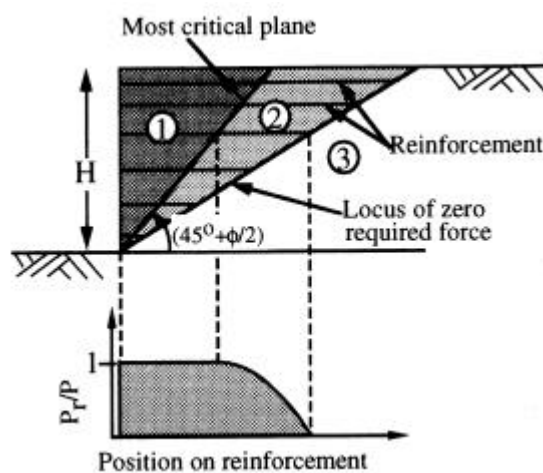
Reinforcement layout and force distribution for ideal length case.
